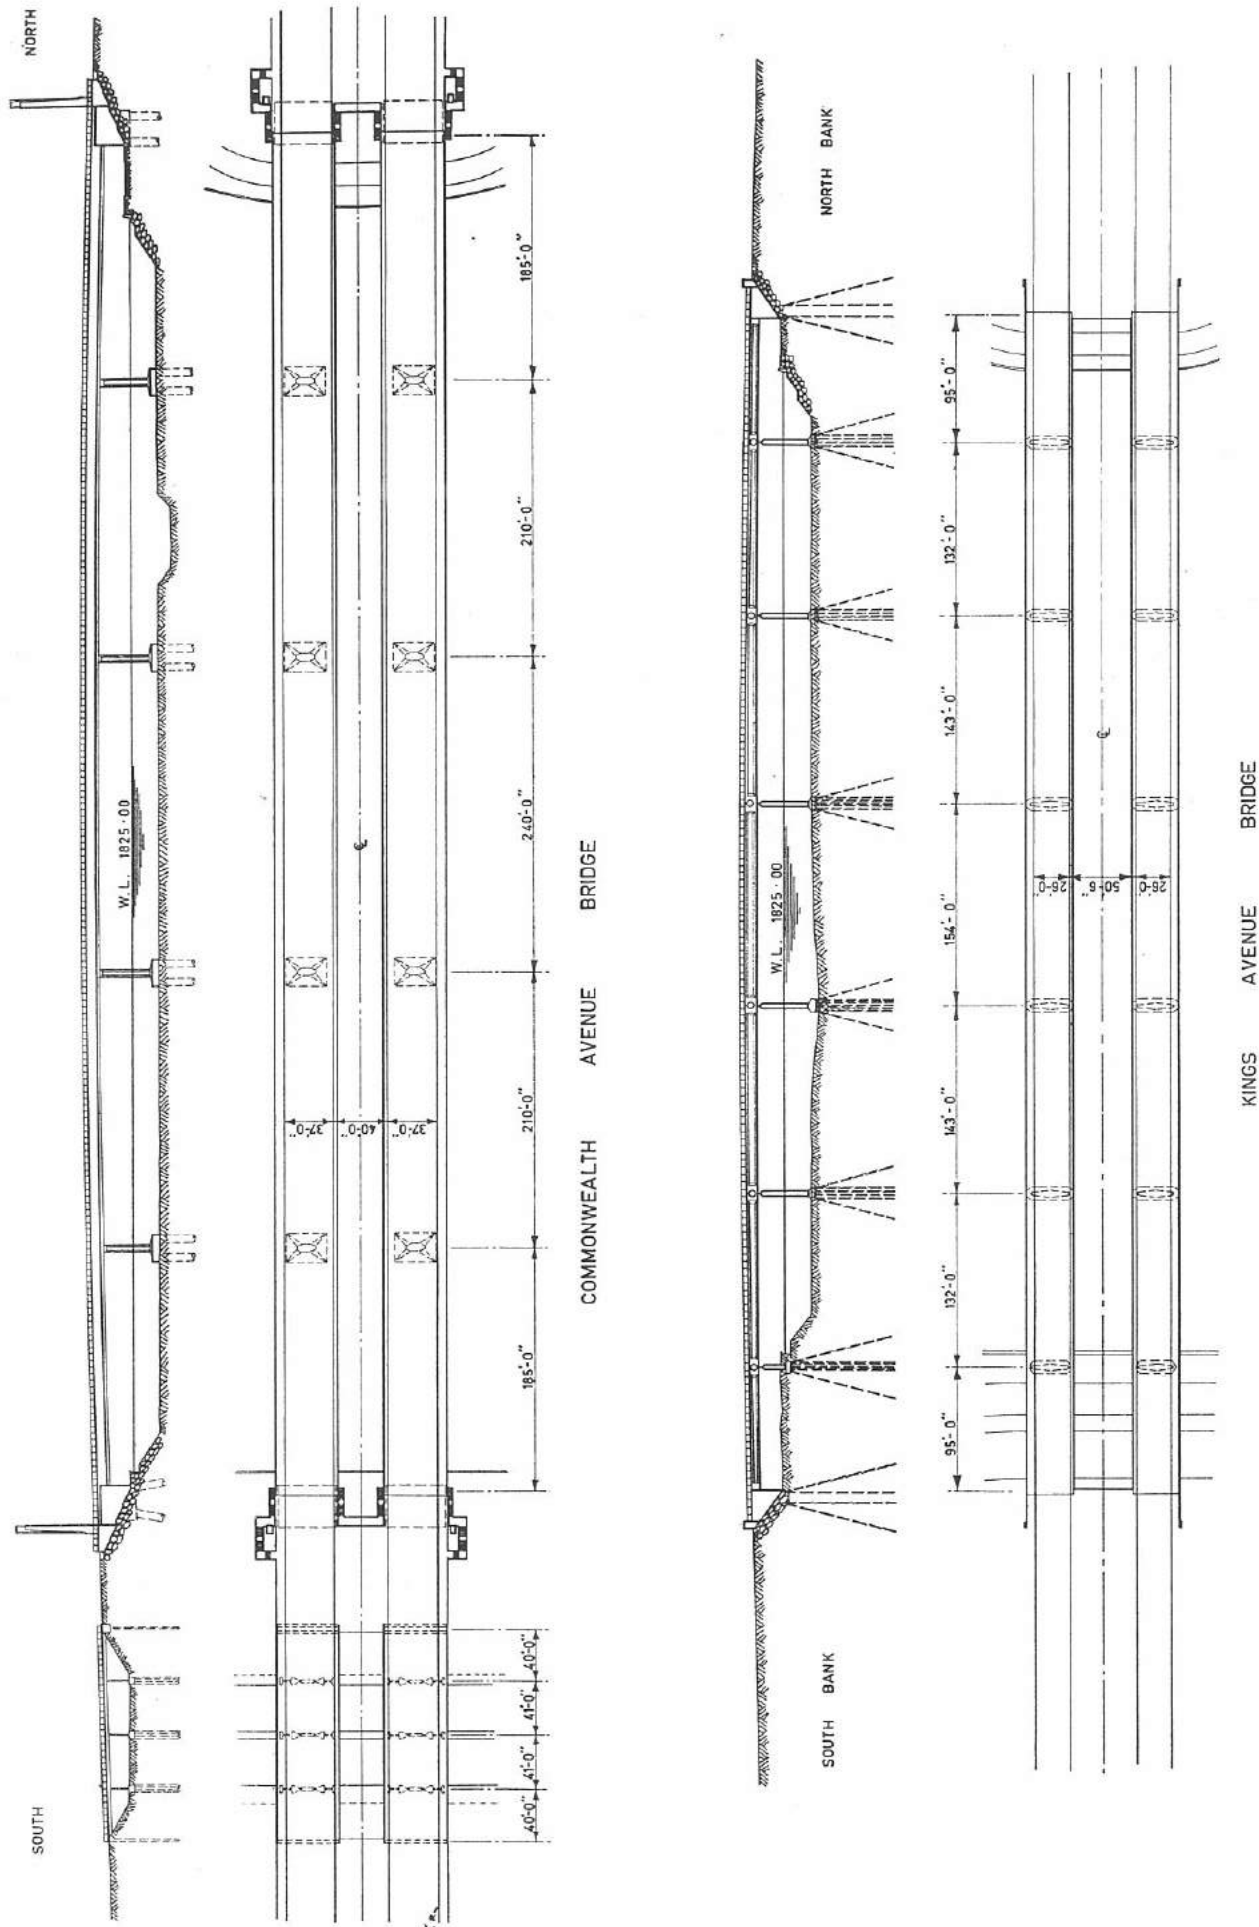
Kings and Commonwealth Avenue Bridges—Plan and Elevation.
